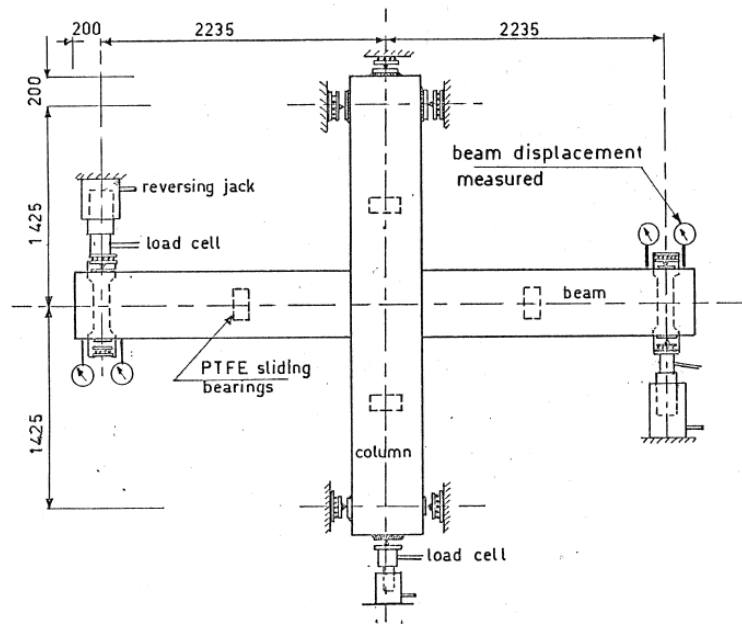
Beam-column joint test arrangement (units in mm) (Fenwick and Nguyen 1981)
